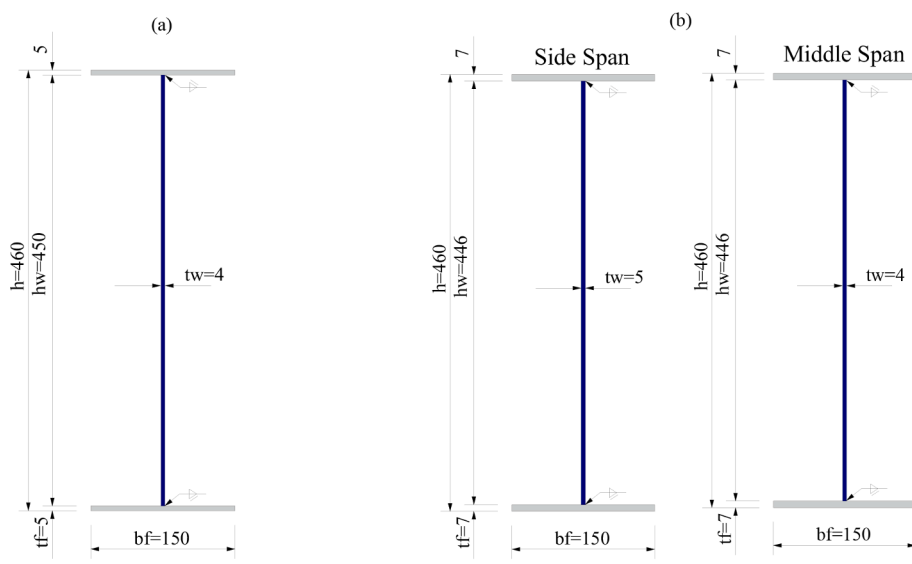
Dimensions of welded I-sections, in mm. (a) Test-1. (b) Test-3 [24].
